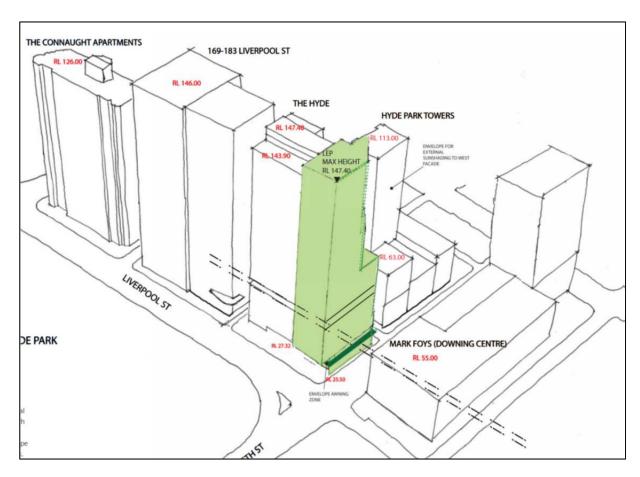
Aerial view of amended building envelope, illustrating the chamfered edge on the southwestern corner
